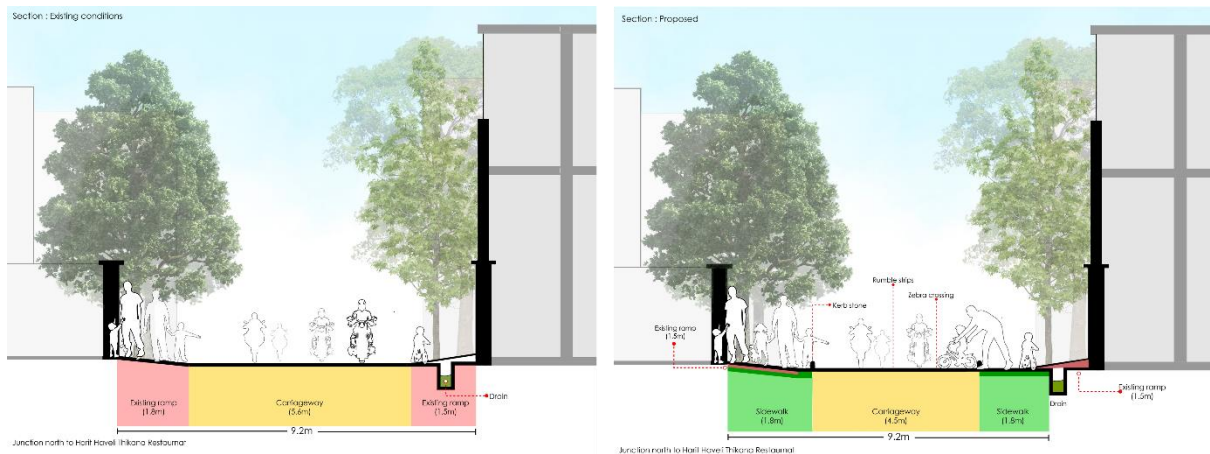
Existing & Proposed Street Section for 9.2m ROW
